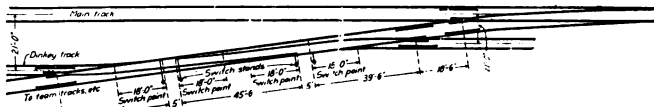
Details of Crossing of Standard Gage and Narrow Gage Track Using Only Standard Frogs and Switches
